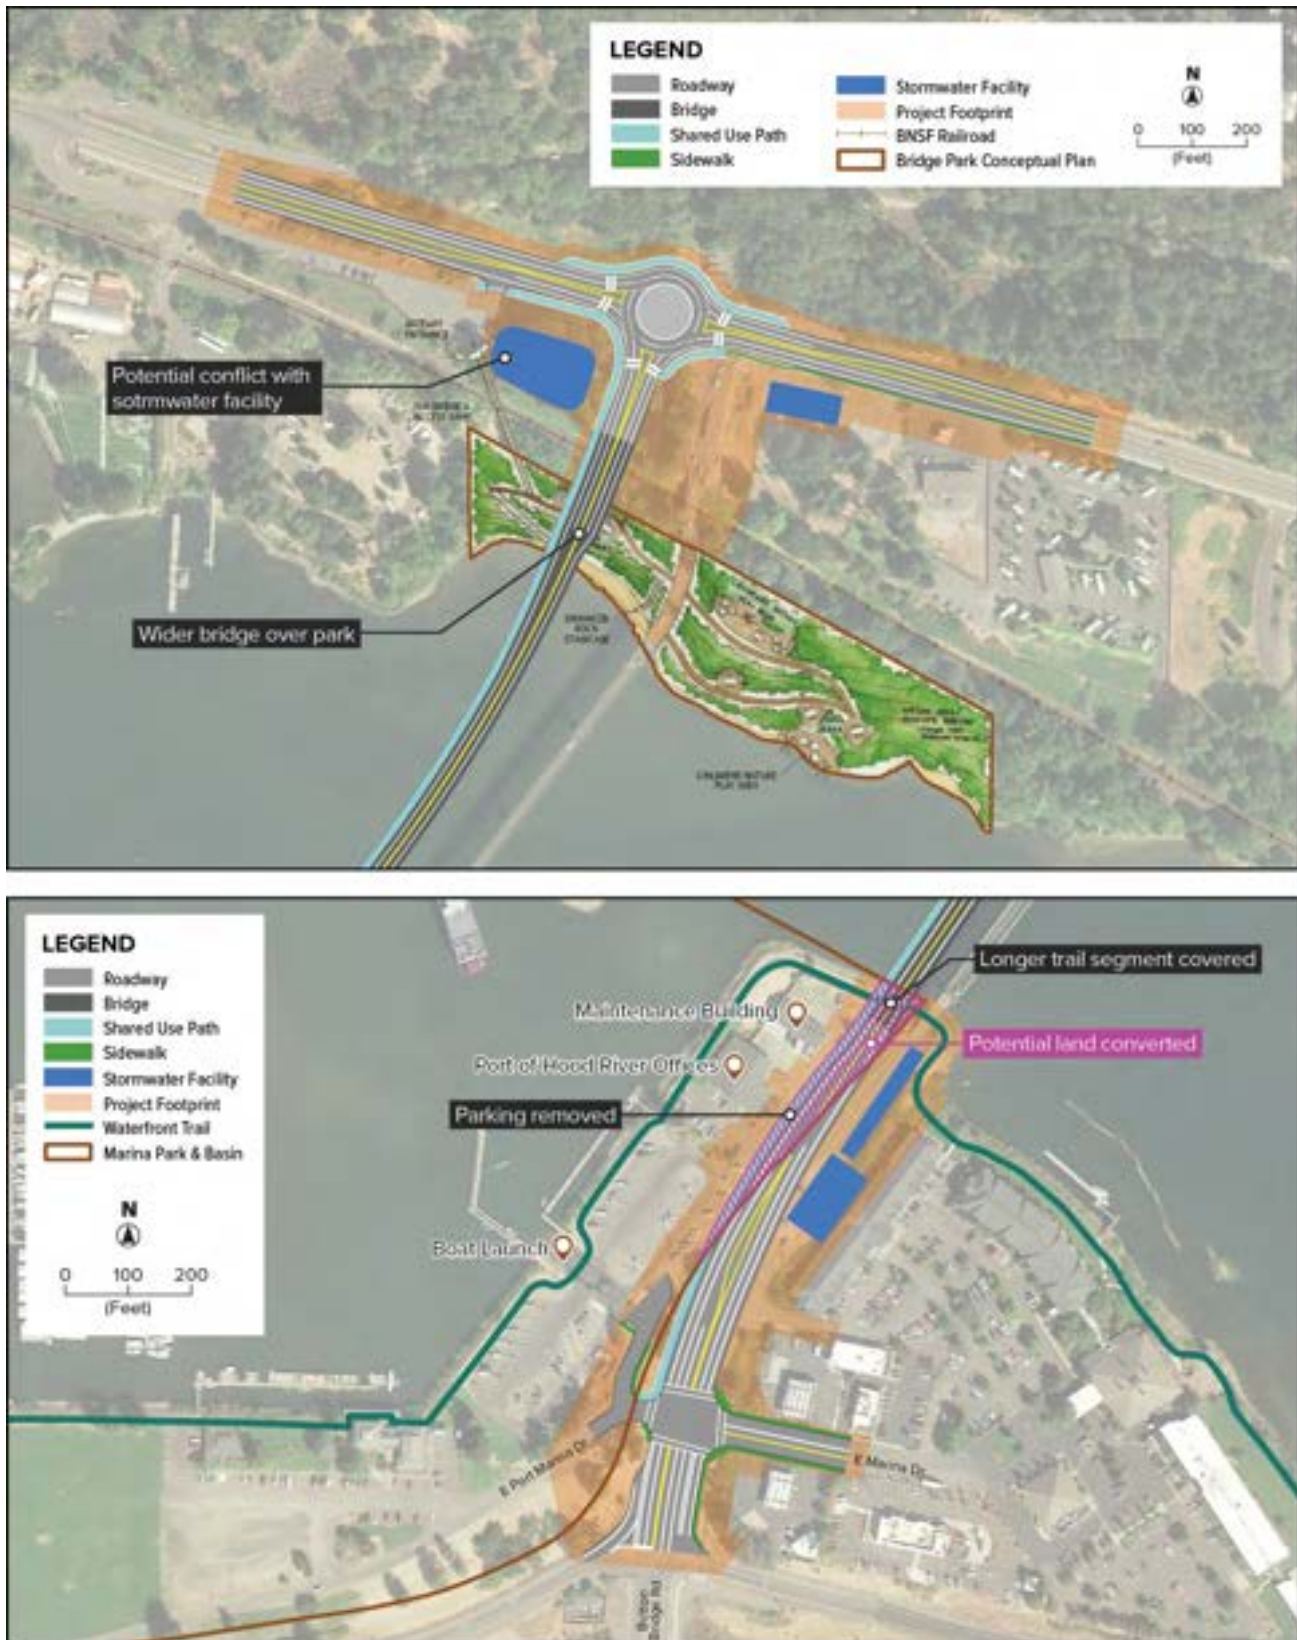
Impacts to Park and Recreation Facilities under Alternative EC-3
